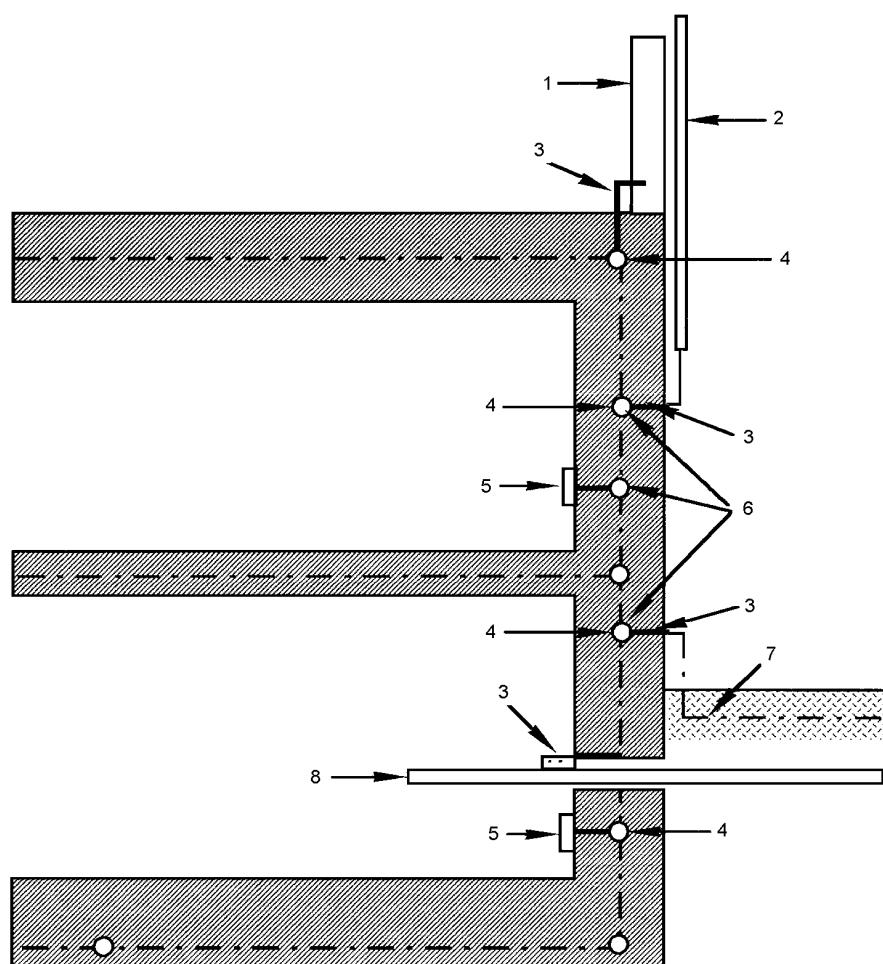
Examples for connection points to the reinforcement in a reinforced concrete wall
